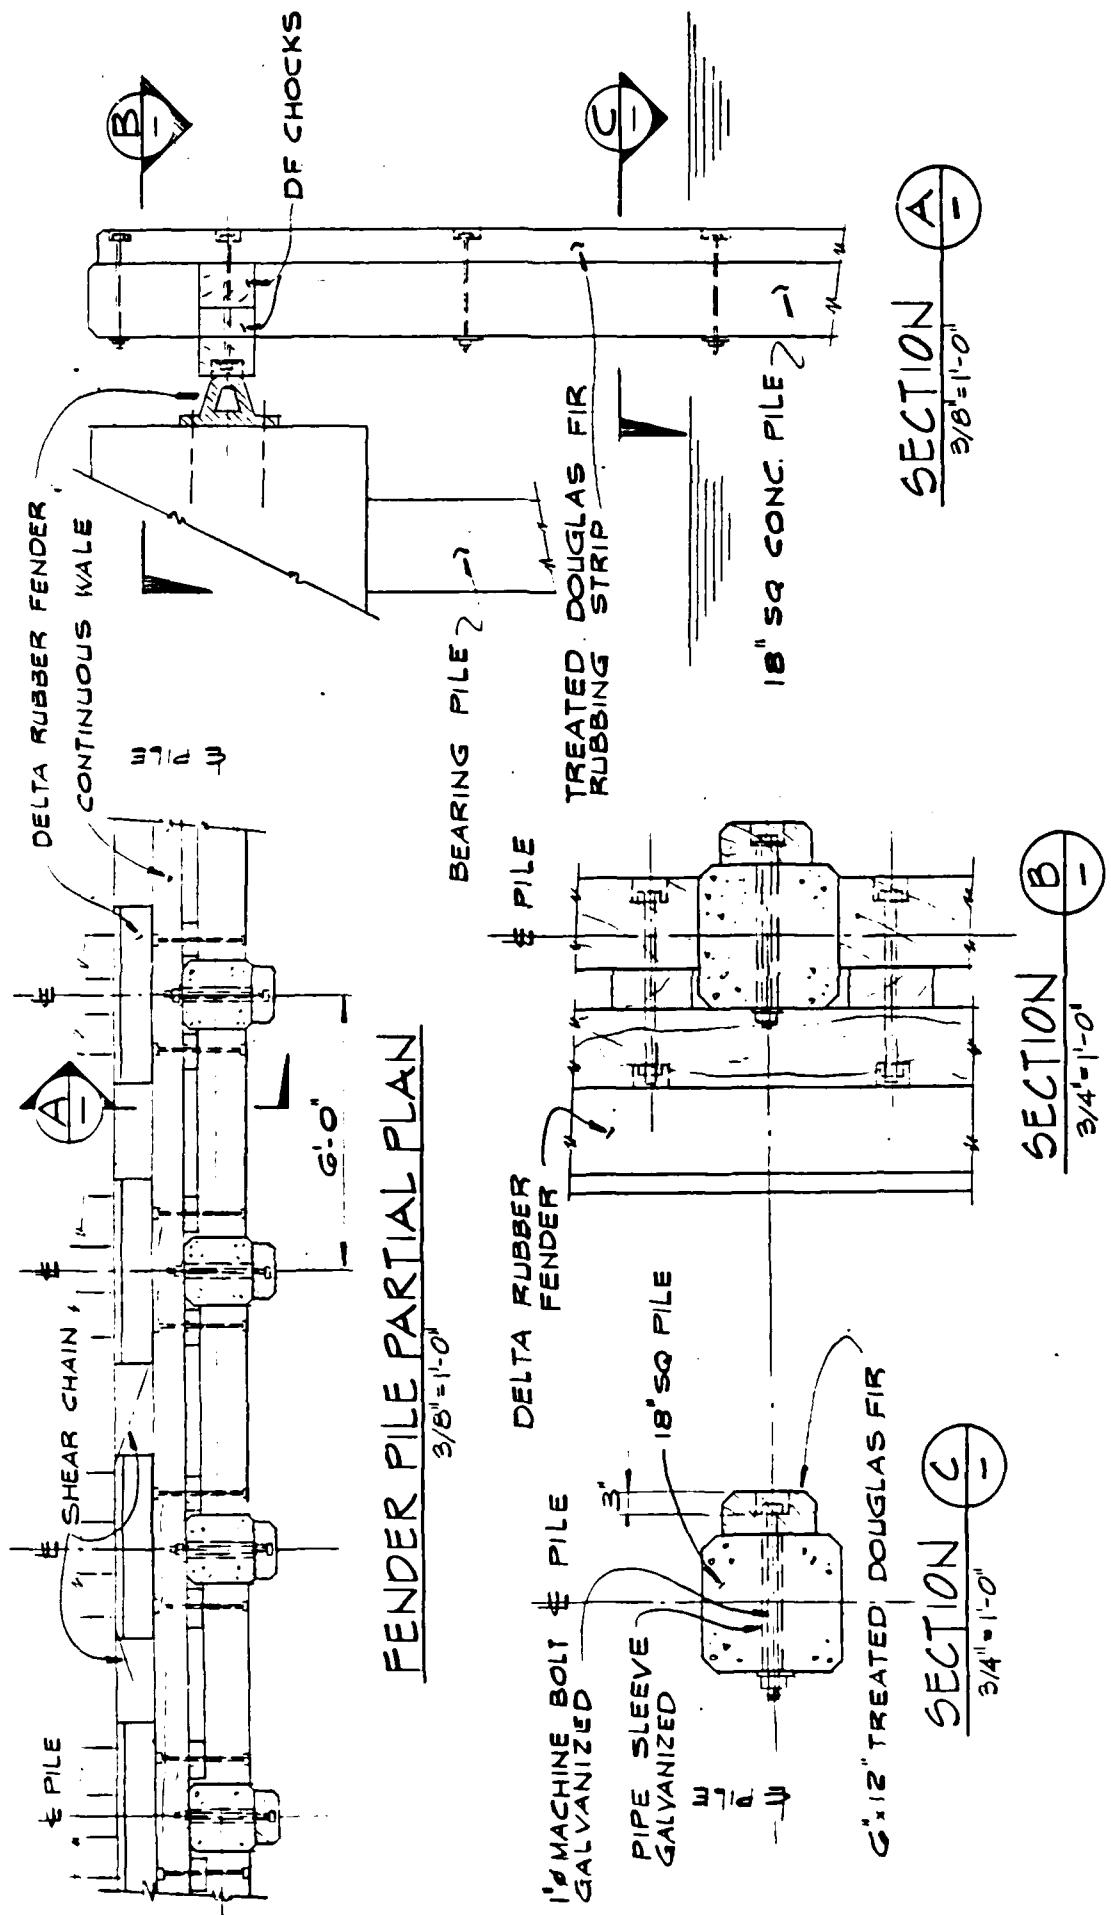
Fender System with Treated Douglas Fir Rubbing Strip
